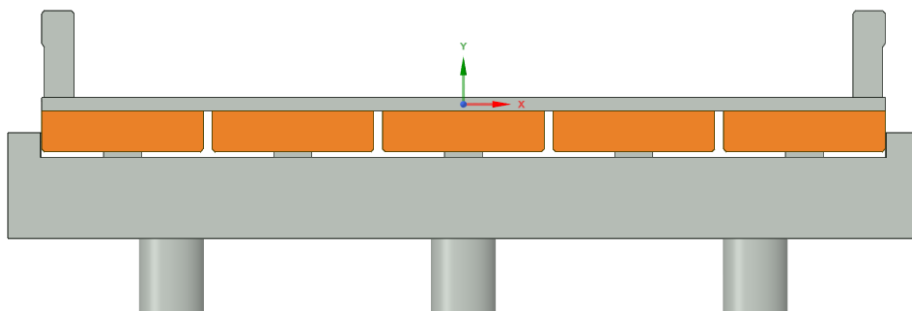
TxDOT 24-ft roadway slab beam bridge
